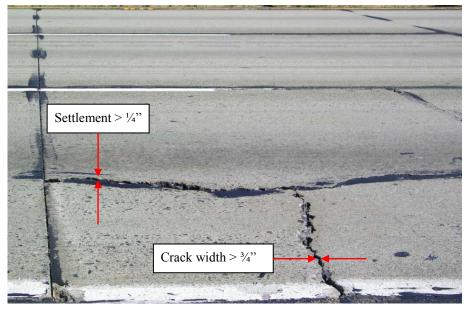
Replace slab and base – 3rd stage cracking and settlement
